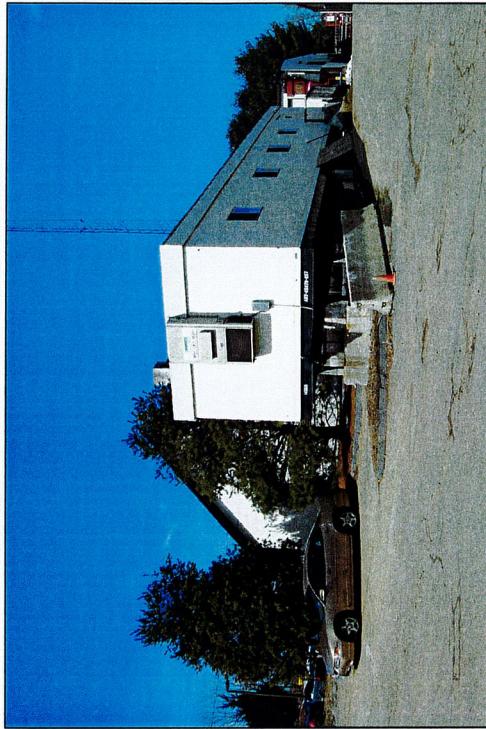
PHOTO B: TAKEN FROM SOUTHERN PARKING LOT
